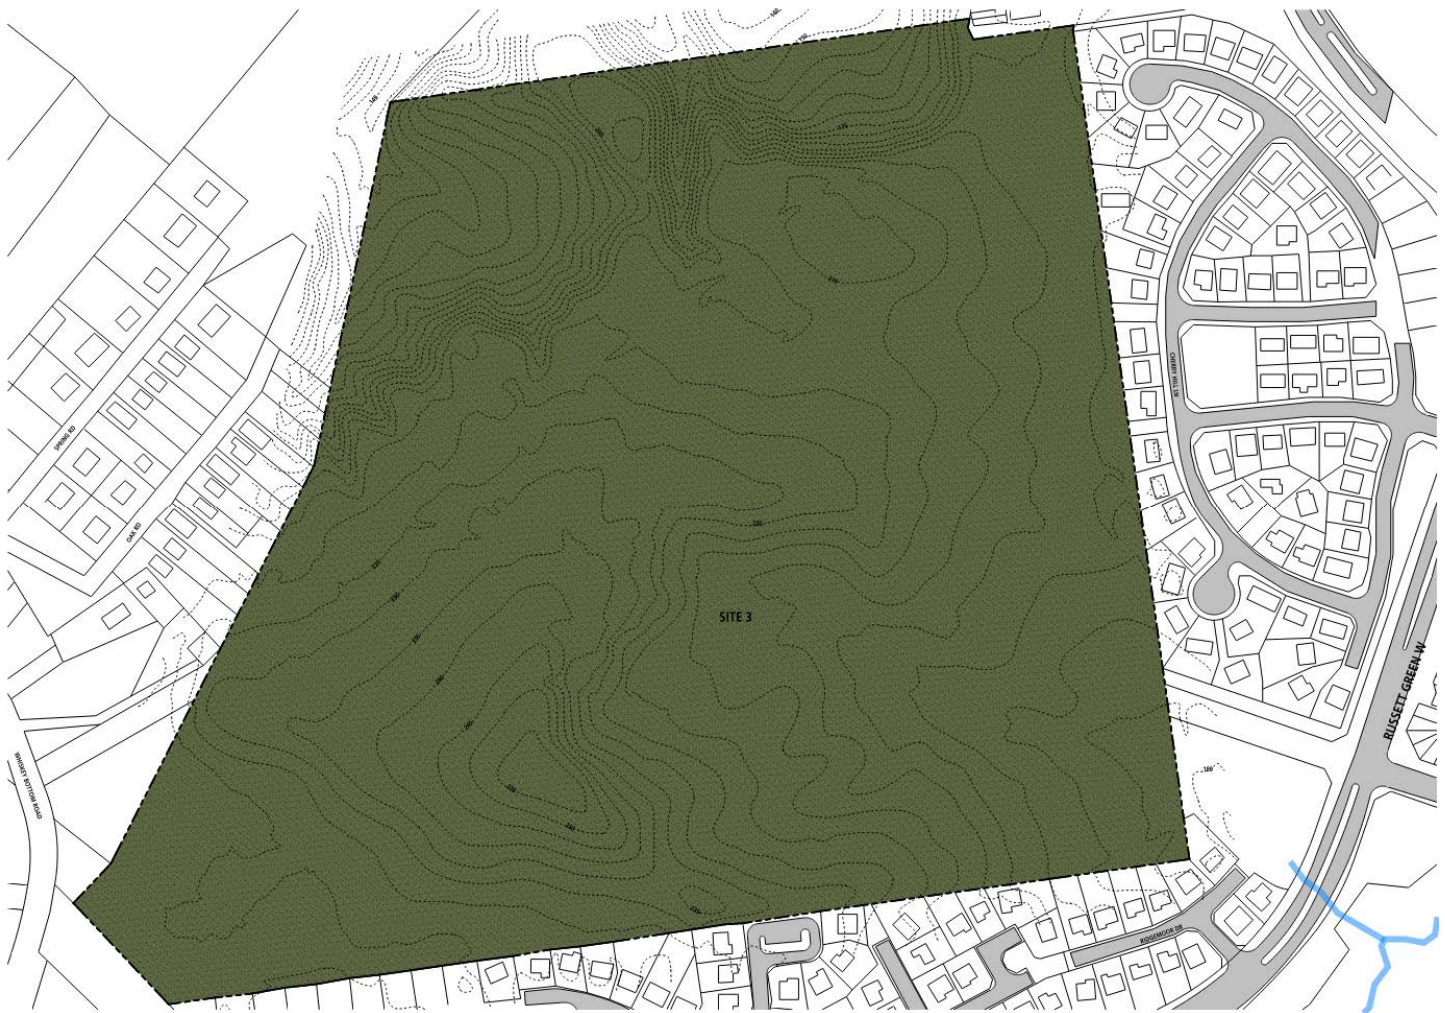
' – Streams, Waterways, and Buffer Zones Plan – Site #3
